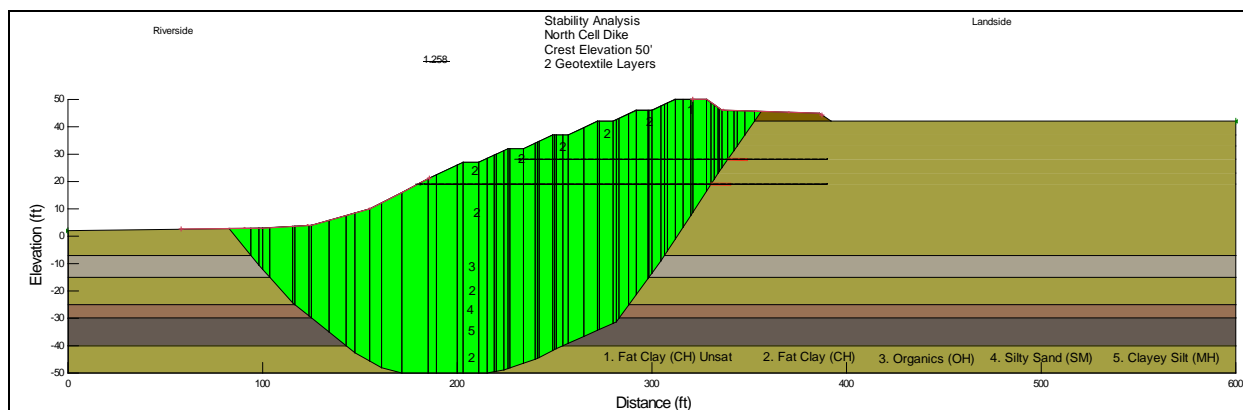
North Cell. Elevation 50'. 2 Geotextile layers. FS = 1.258.
